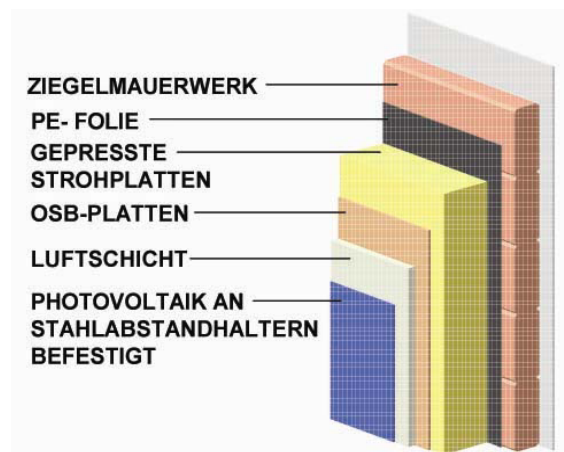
Photovoltaic façade construction: photovoltaic panel (clip-on system), air space, oriented-strand board, compressed-fibre straw panel, polyethylene foil, brick masonry wall, interior stucco.
